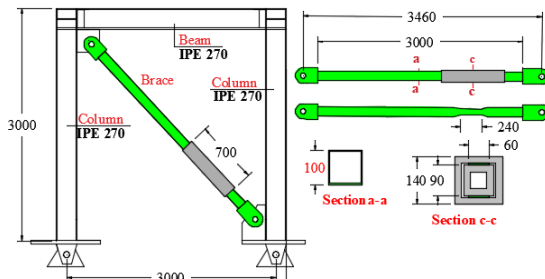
Framing details and arrangement of the tested specimen (all dimensions are in mm).
